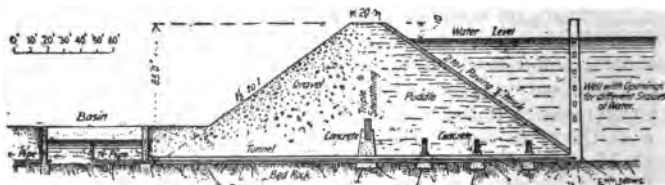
Cross Section of Dam at Sante Fe, N. M.
